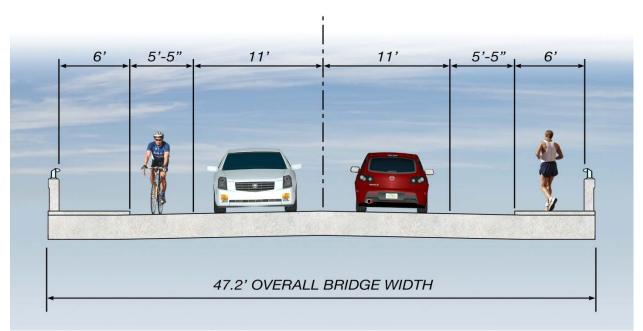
Proposed Bridge Typical Section – Recommended Alternative
